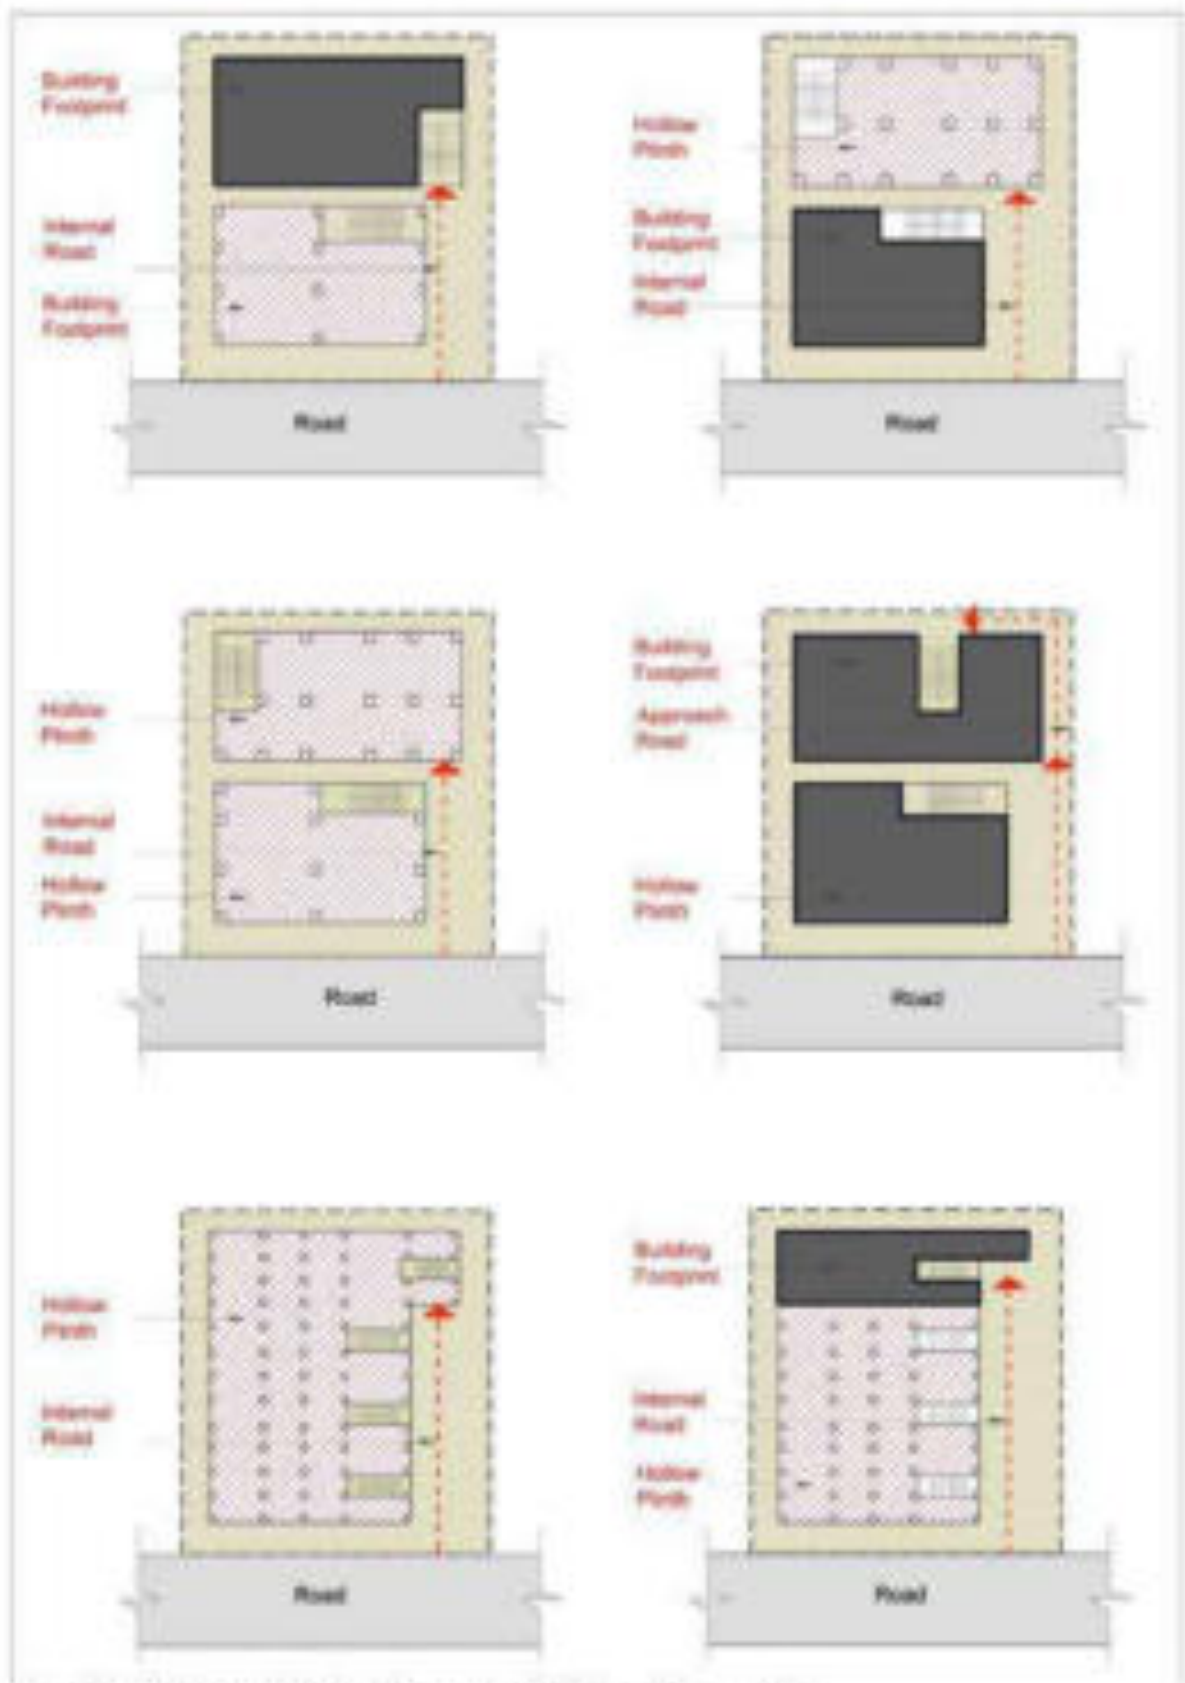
Internal Road and Approach to Building and Common Plot
